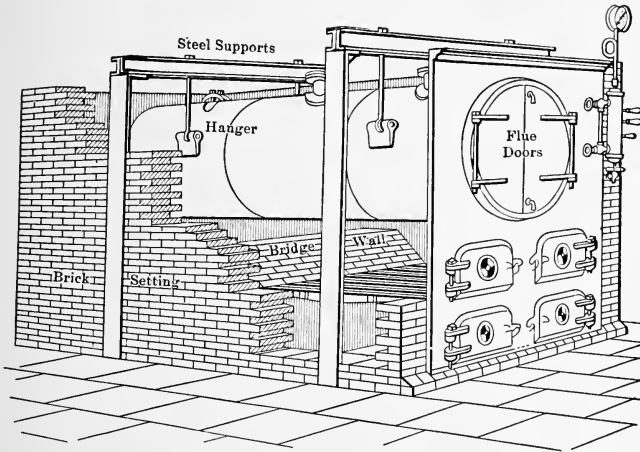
Return Tubular Boiler Setting — Outside Suspension Type.
